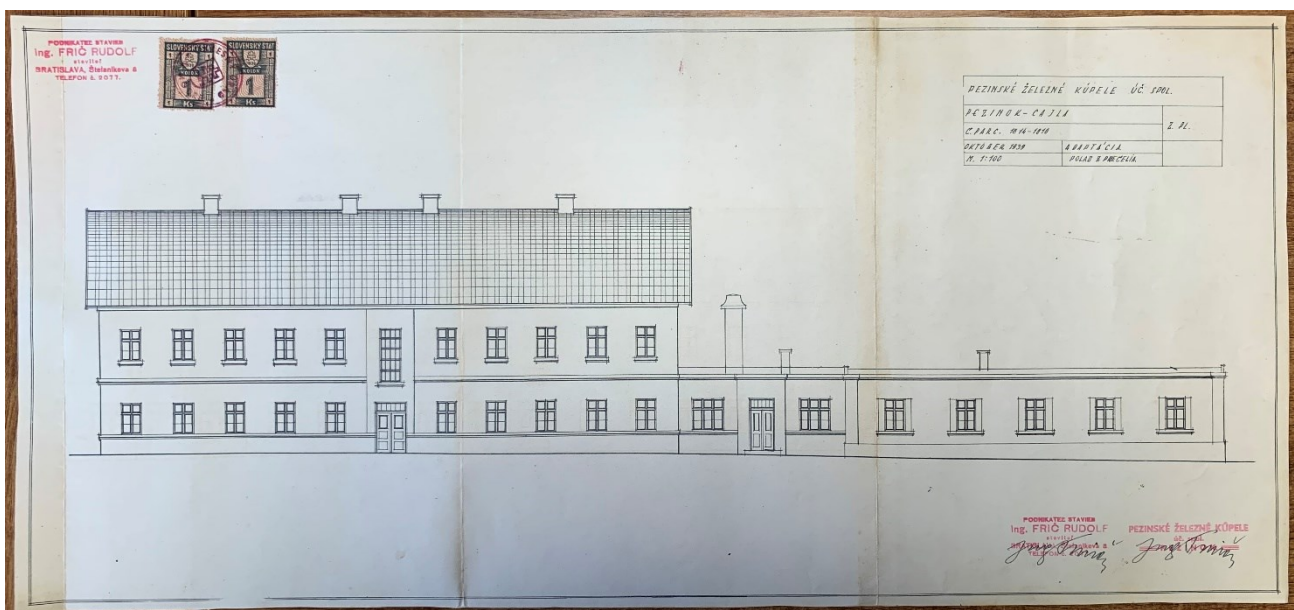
The Pezínok Institute for People with Nervous and Mental Health Disorders. Adaptation of the Antimony factory building to a women's standard ward with an added extension. Elevation. A new women's pavilion with a chapel was built in 1941. (Source: State Archives in Bratislava, Slovakia, 1940)
